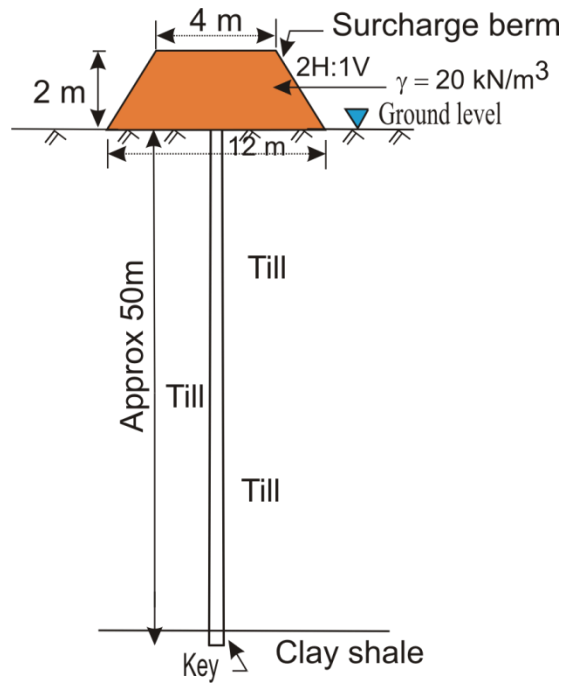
Cross-section of soil-bentonite wall with surcharge berm at the top.
